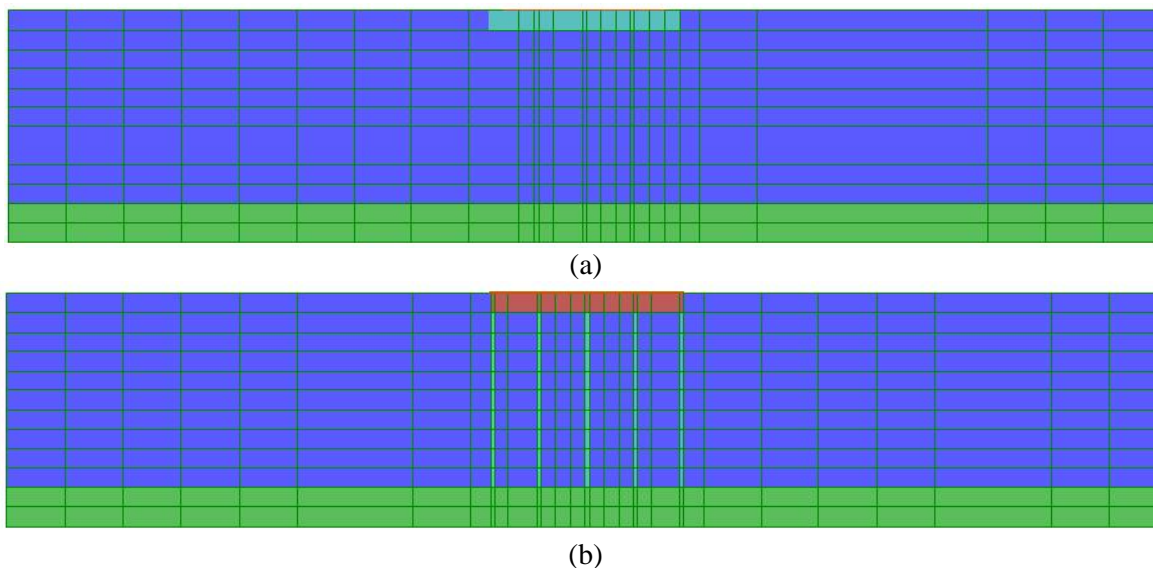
Cross section of shallow foundation on liquefiable soil without, then with stone columns, respectively.
